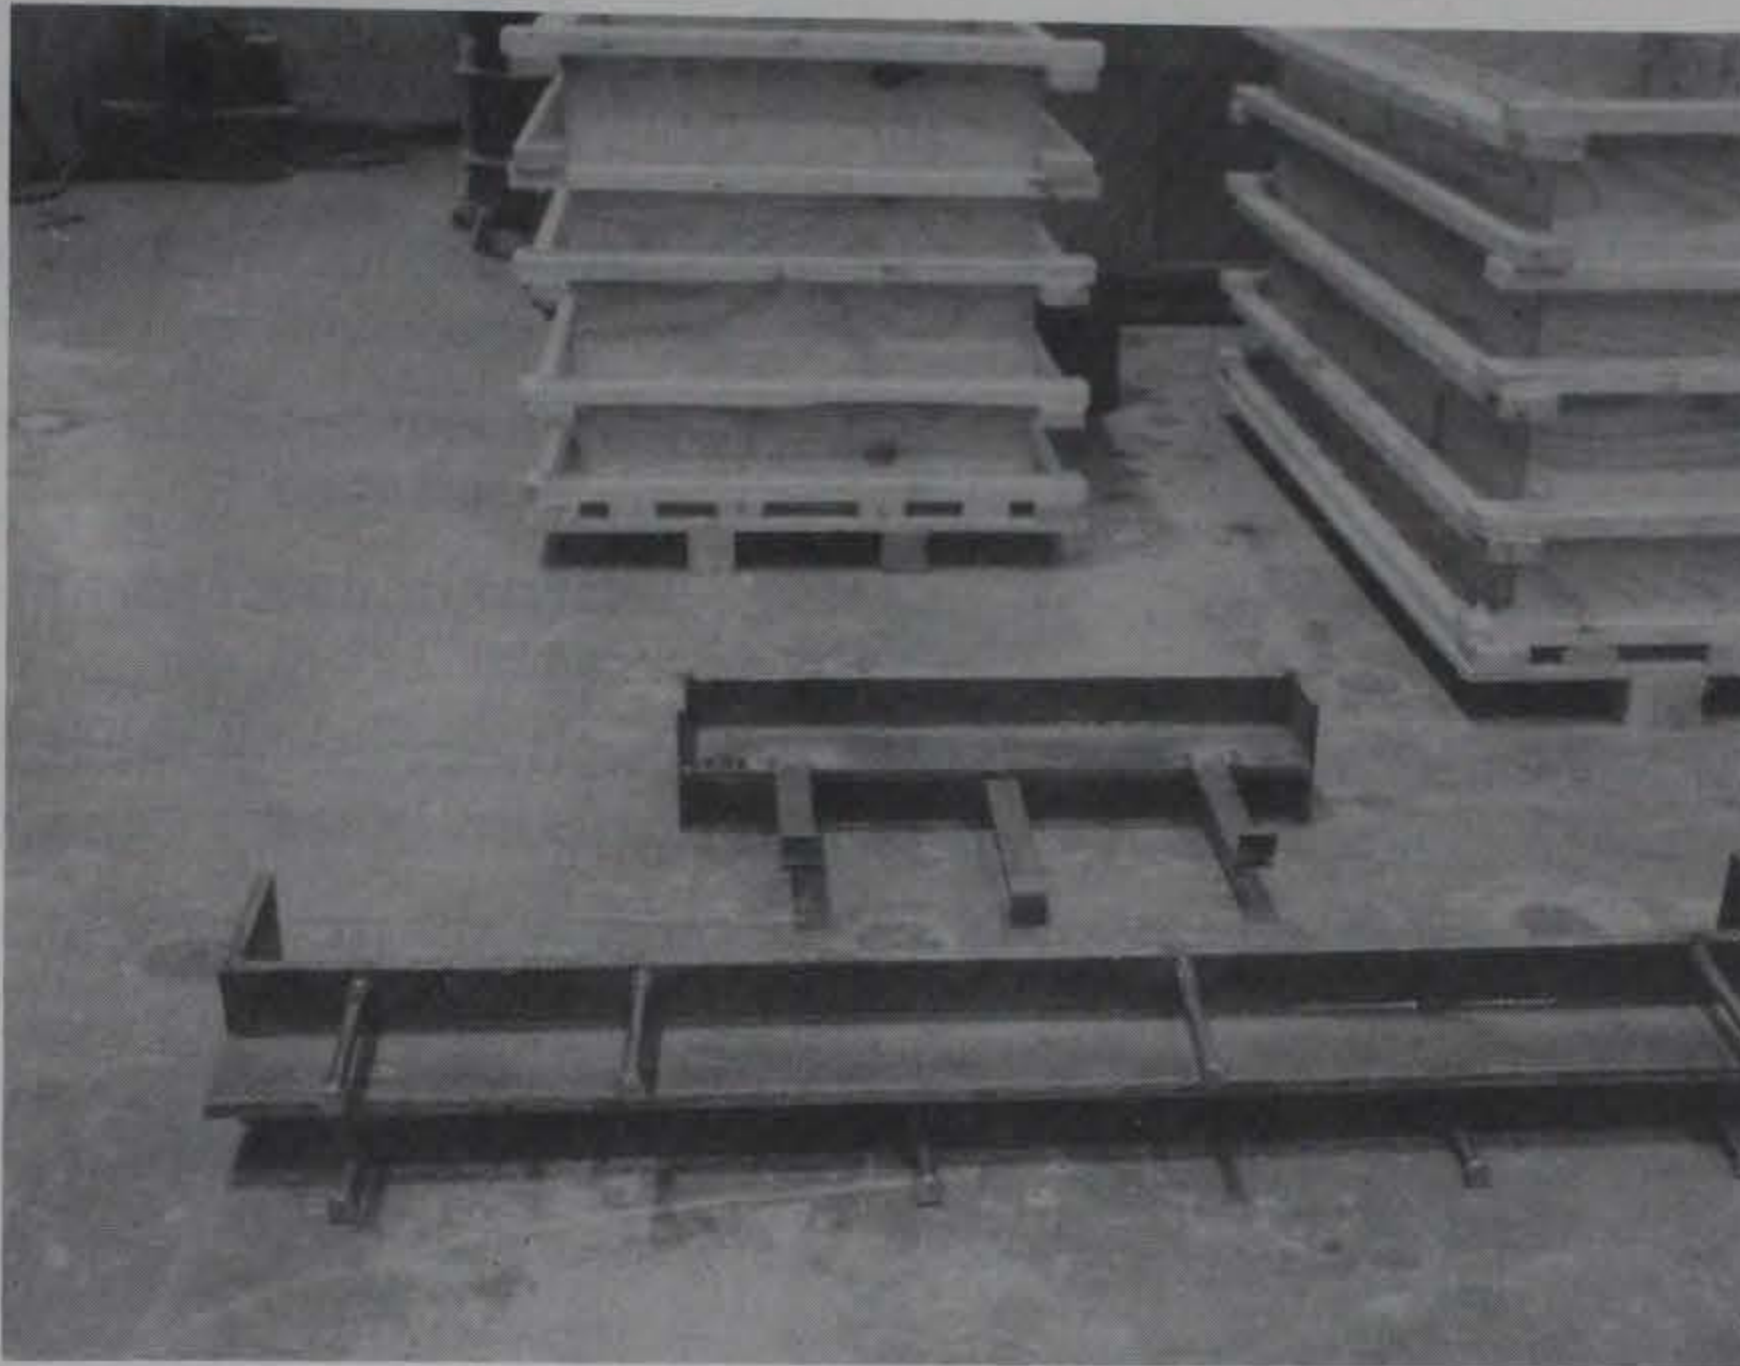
Typical anchor strap and headed stud wall armor assemblies
